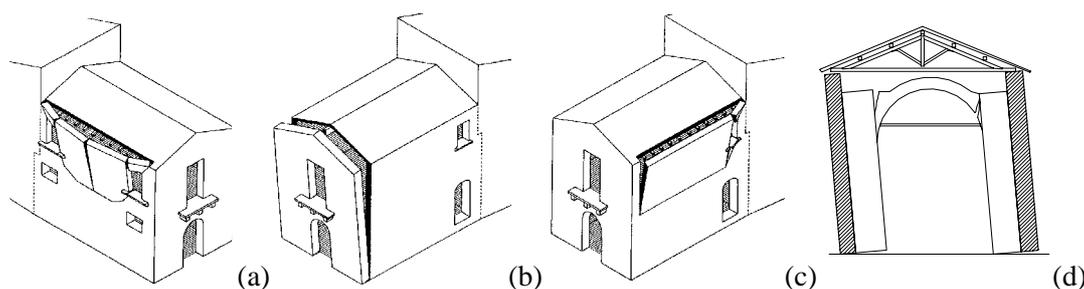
(a,b,c) Wall overturning (De Benedectis et al.,1993); (d) rocking of transverse arch pillars.
